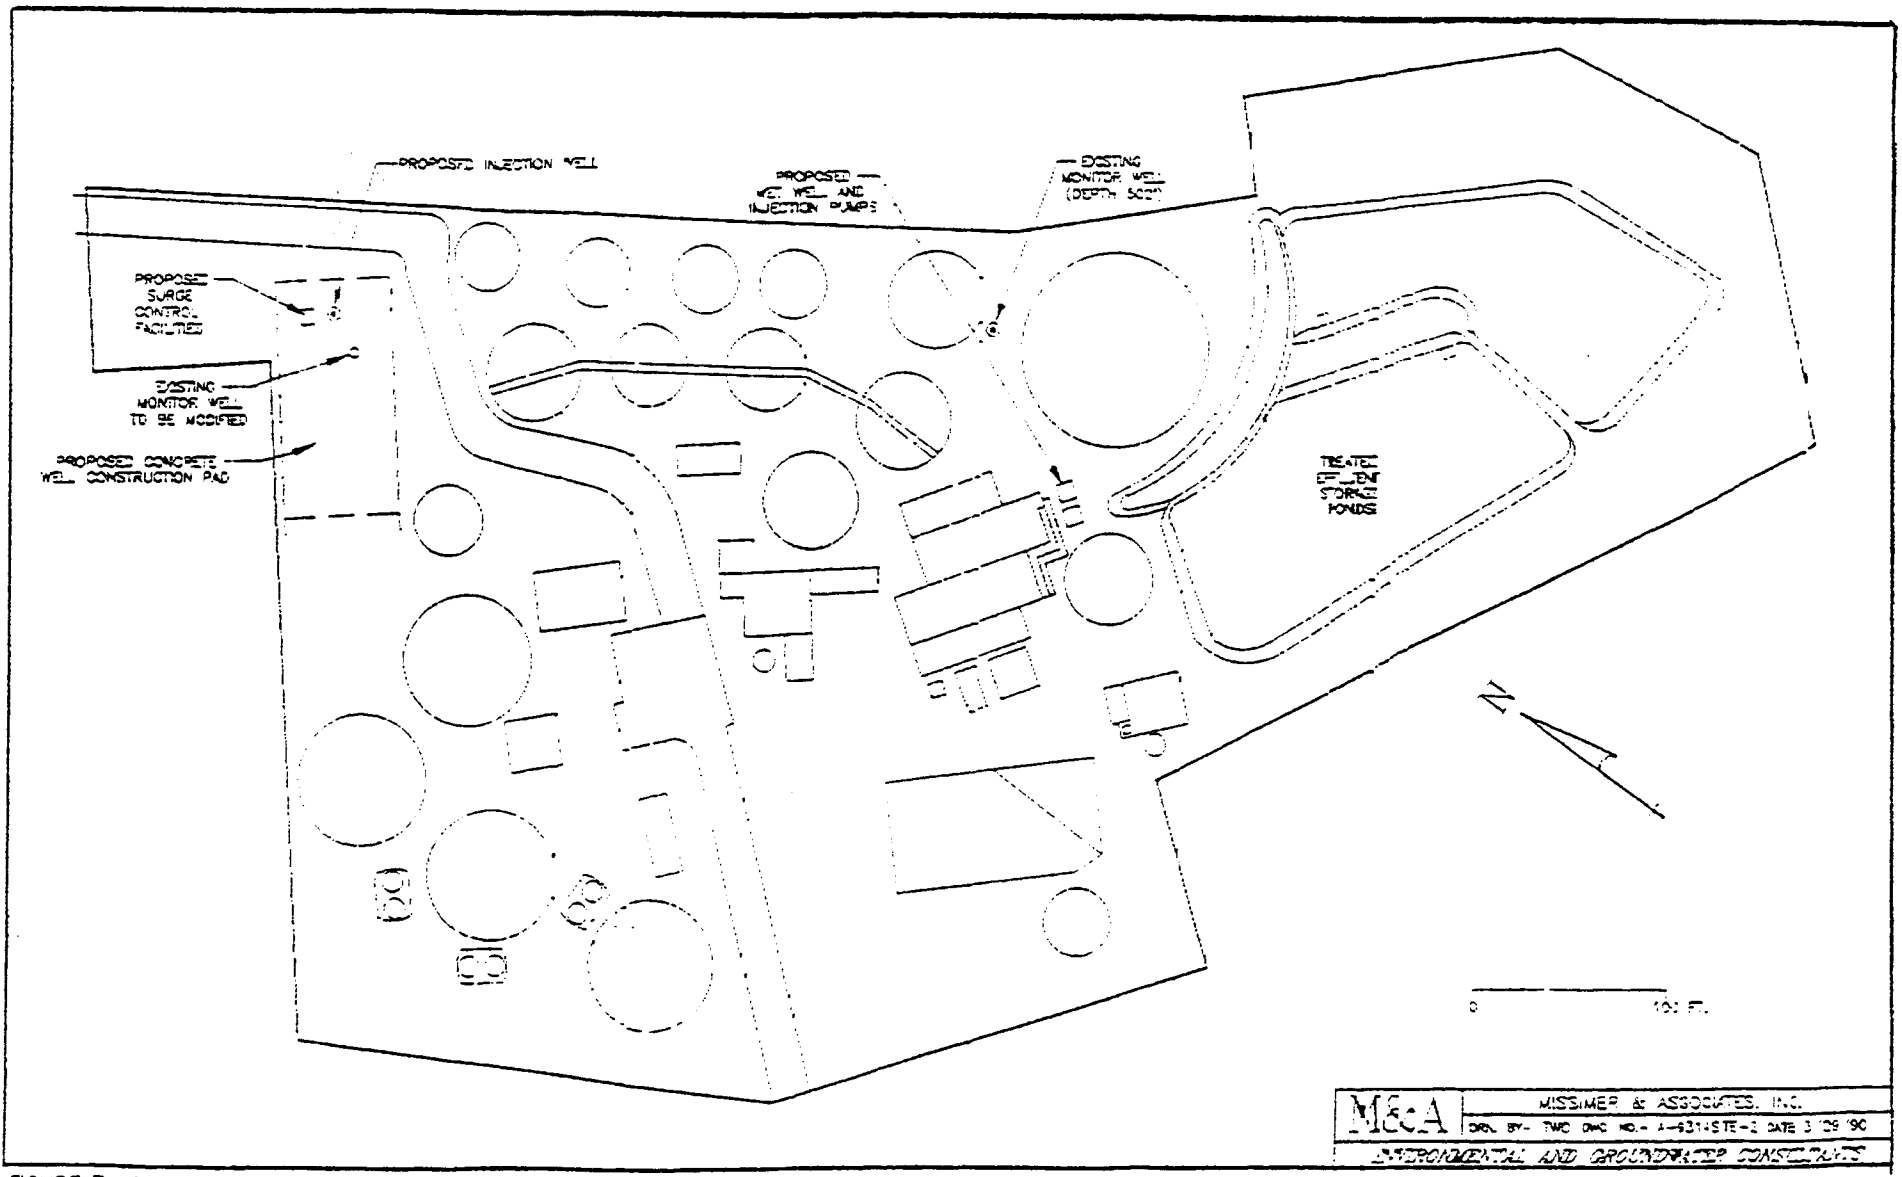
SITE PLAN OF EXISTING WATER AND WASTEWATER TREATMENT PLANT SHOWING PROPOSED INJECTION WELL FACILITIES.
